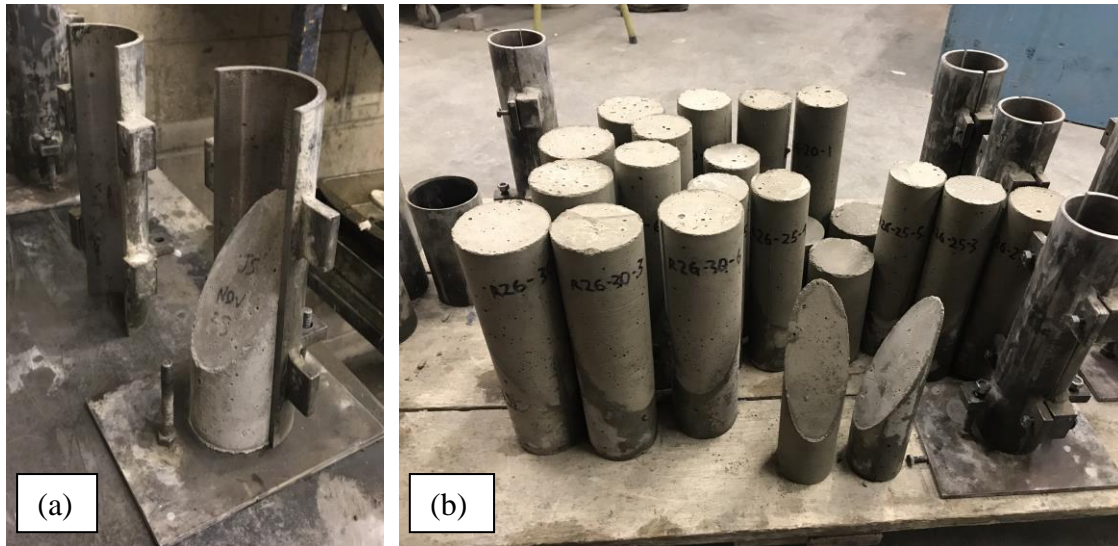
(a) Careful Insertion of Substrate into Mold prior to Repair Casting; (b) Demolded Specimens
